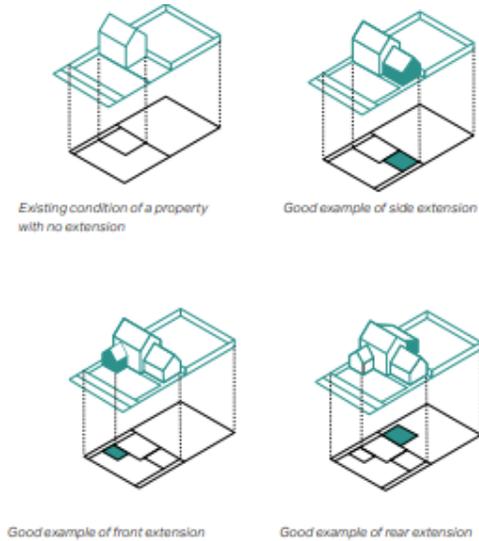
Good examples of approaches to existing building scale, massing and building line.
